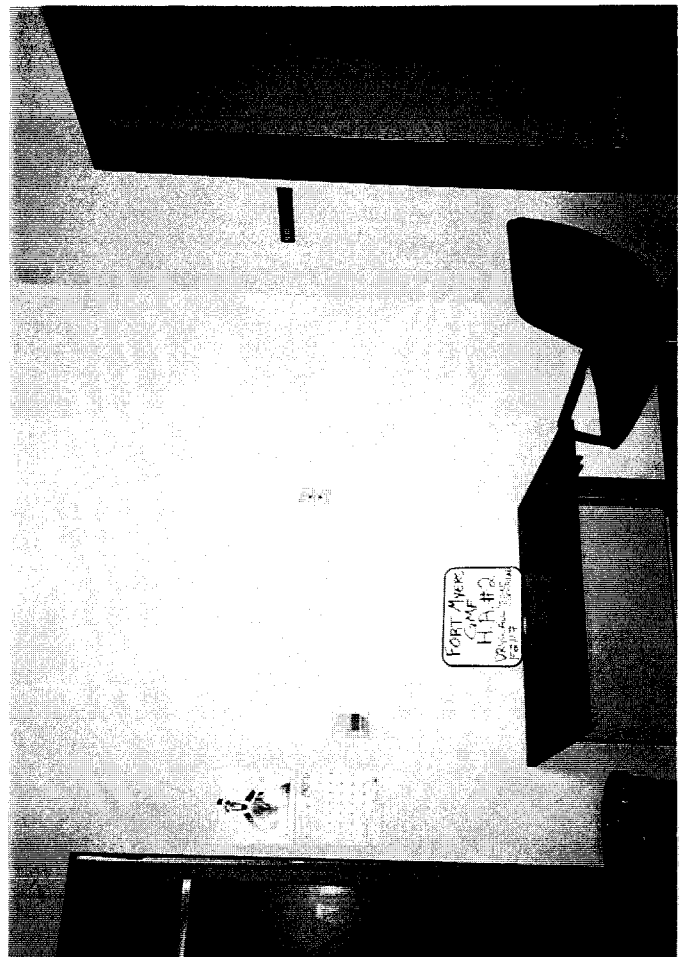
Homogeneous Area 2: Drywall/joint compound, as found in room F2-117 (non-ACBM)
